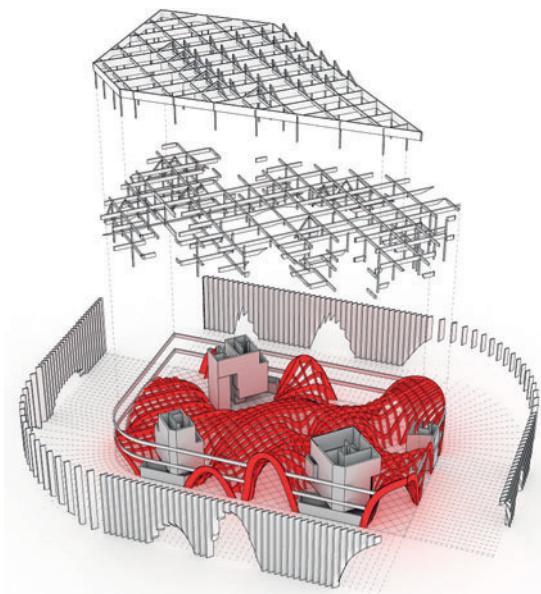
Layout of timber structure of the France Pavilion. The gridshell is shown in red.
